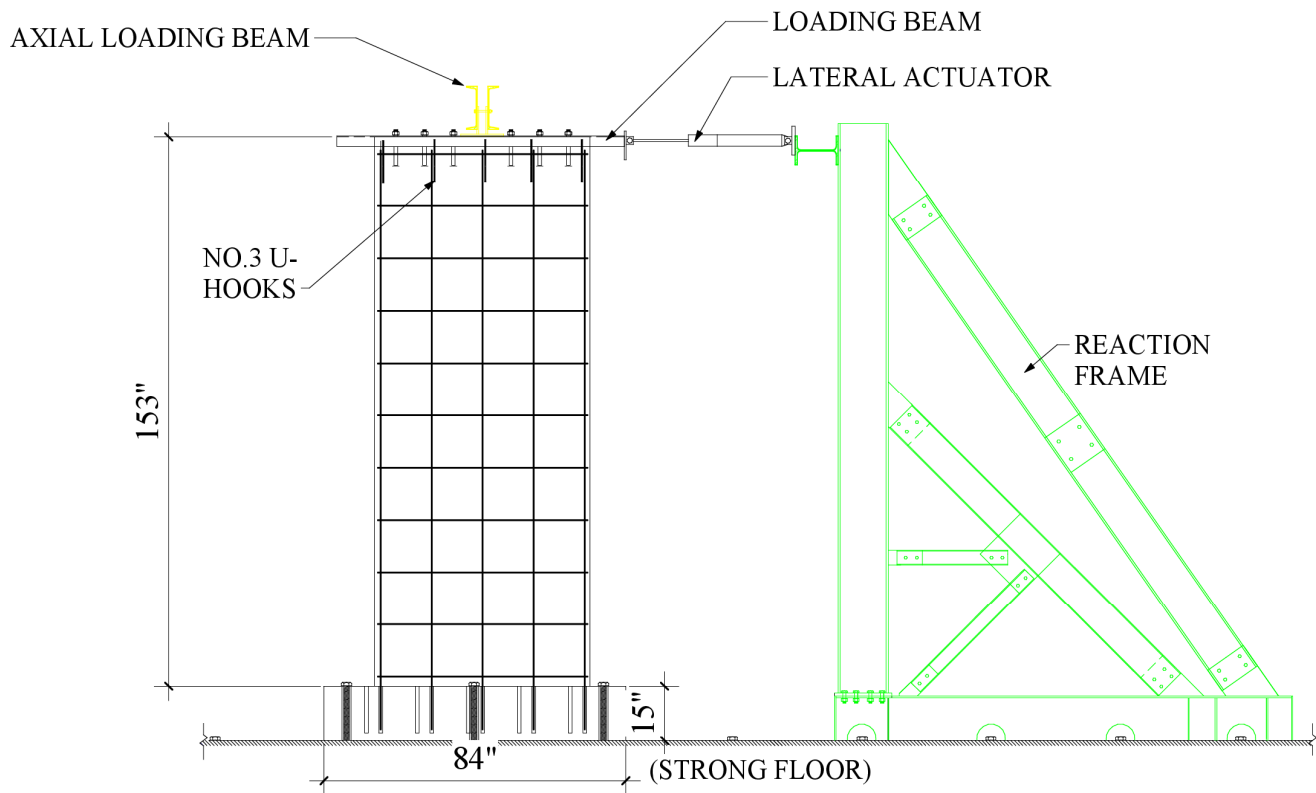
Elevation A, Test Setup (West Face of Wall)
